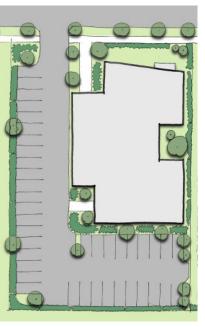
a - plan of preferred off street car parking locations in Precinct 3
